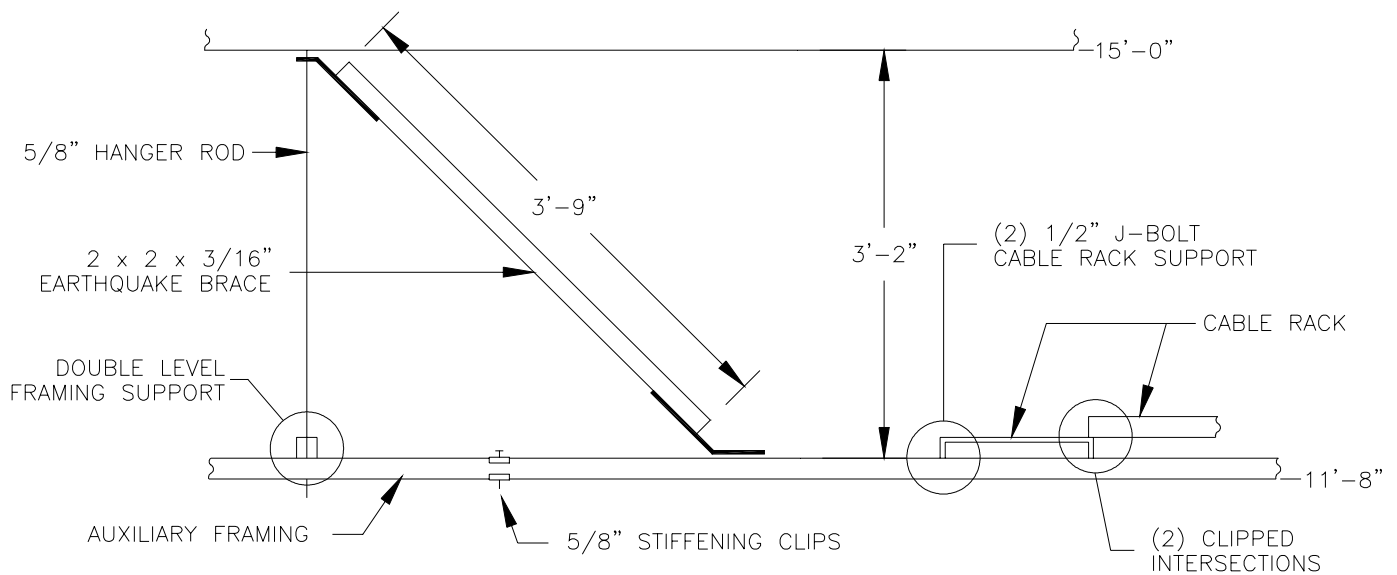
Typical Single Level Auxiliary Framing Arrangement
